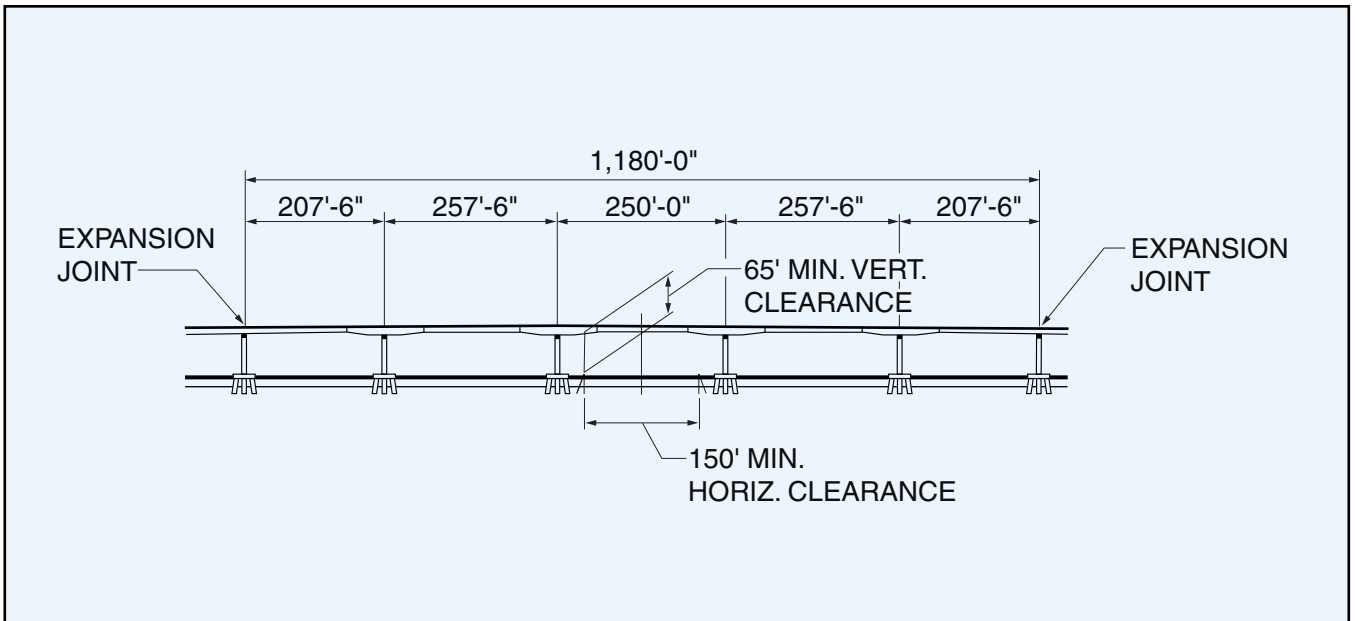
Five-span channel unit elevation drawing. Note: 1 ft = 0.305 m; 1 in. = 25.4 mm.
